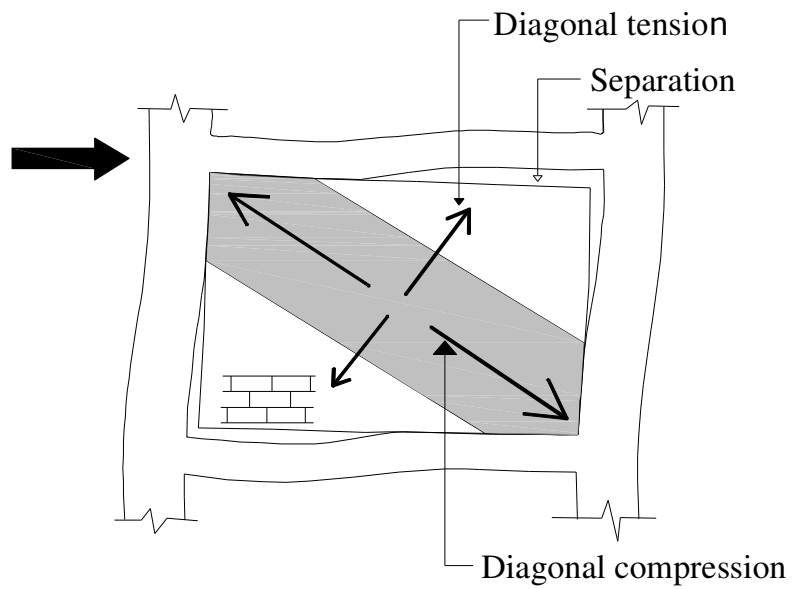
Diagonal tensile and compression failure of masonry infill.
